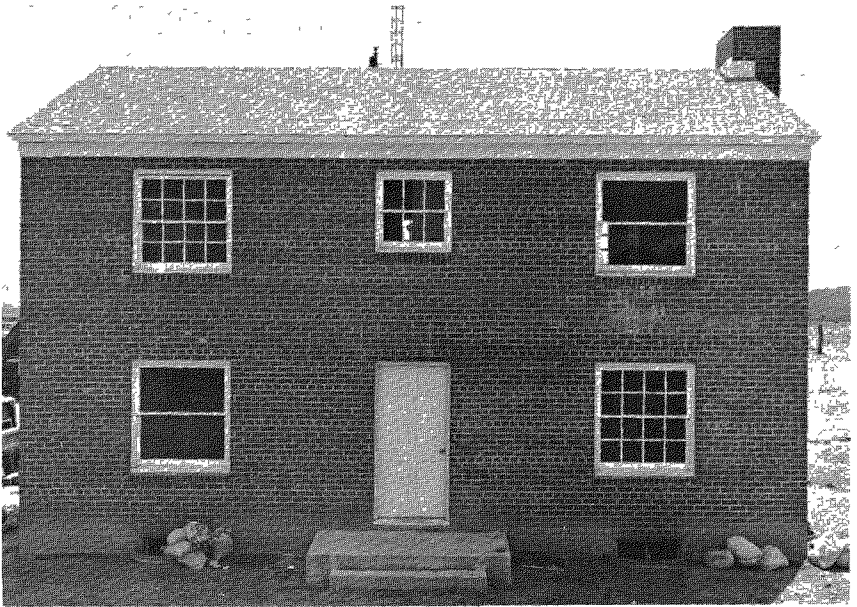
Unreinforced brick house before a nuclear explosion, Nevada Test Site.
